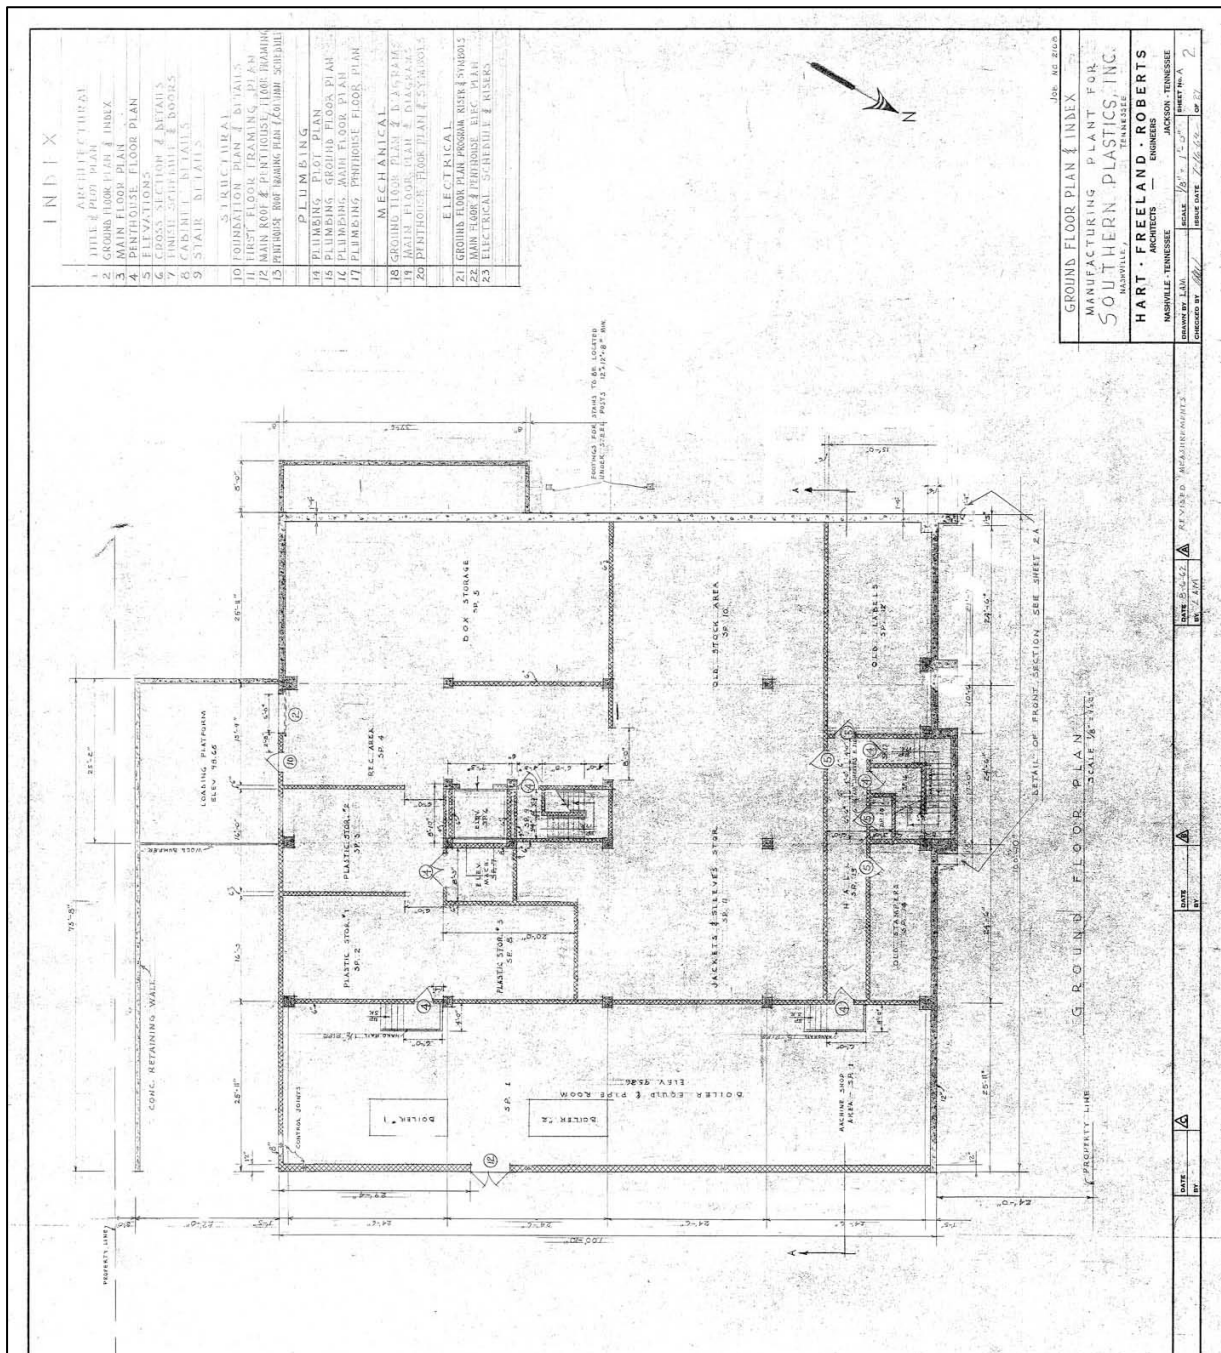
Ground floor plan of the Southern Plastic Inc. Pressing Plant, 16 July 1962.
